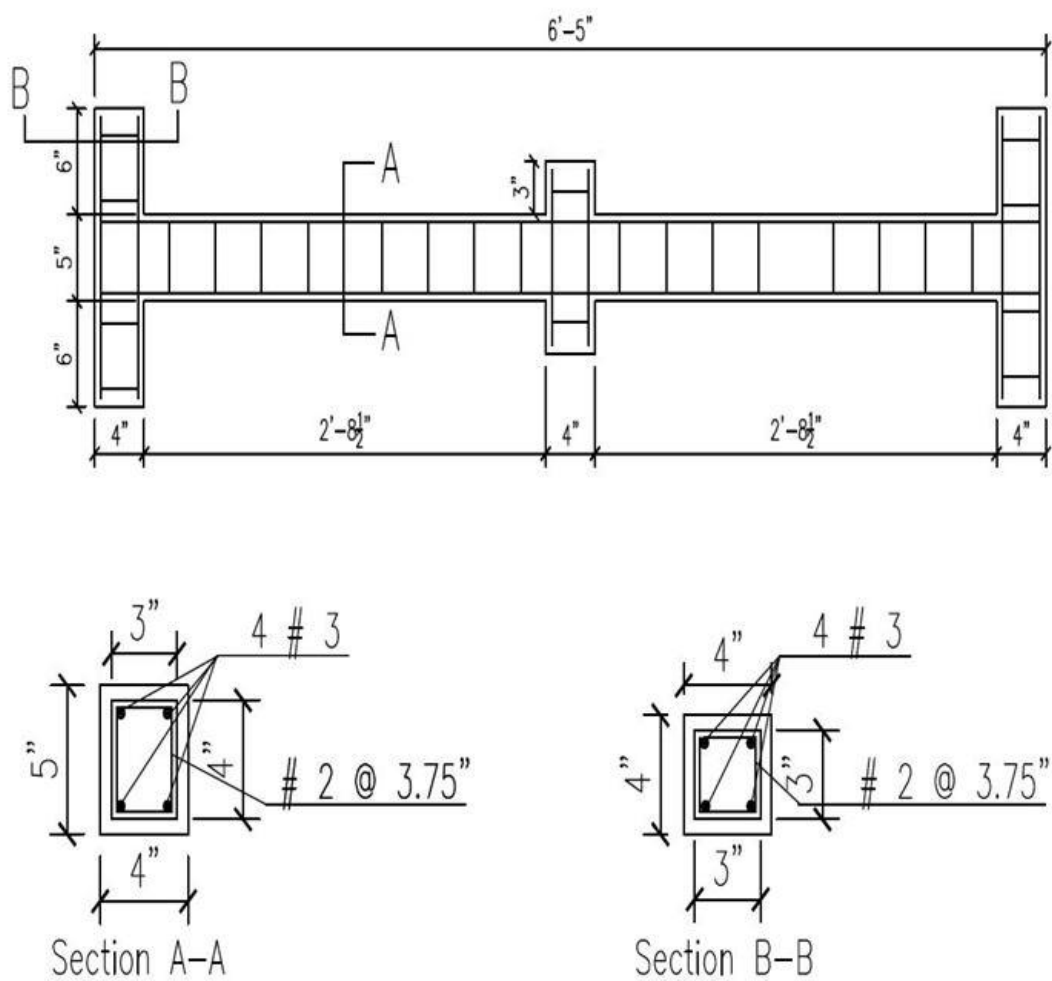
Typical Cross-section for Two-span Sub-assembly with BFRP Reinforcement
